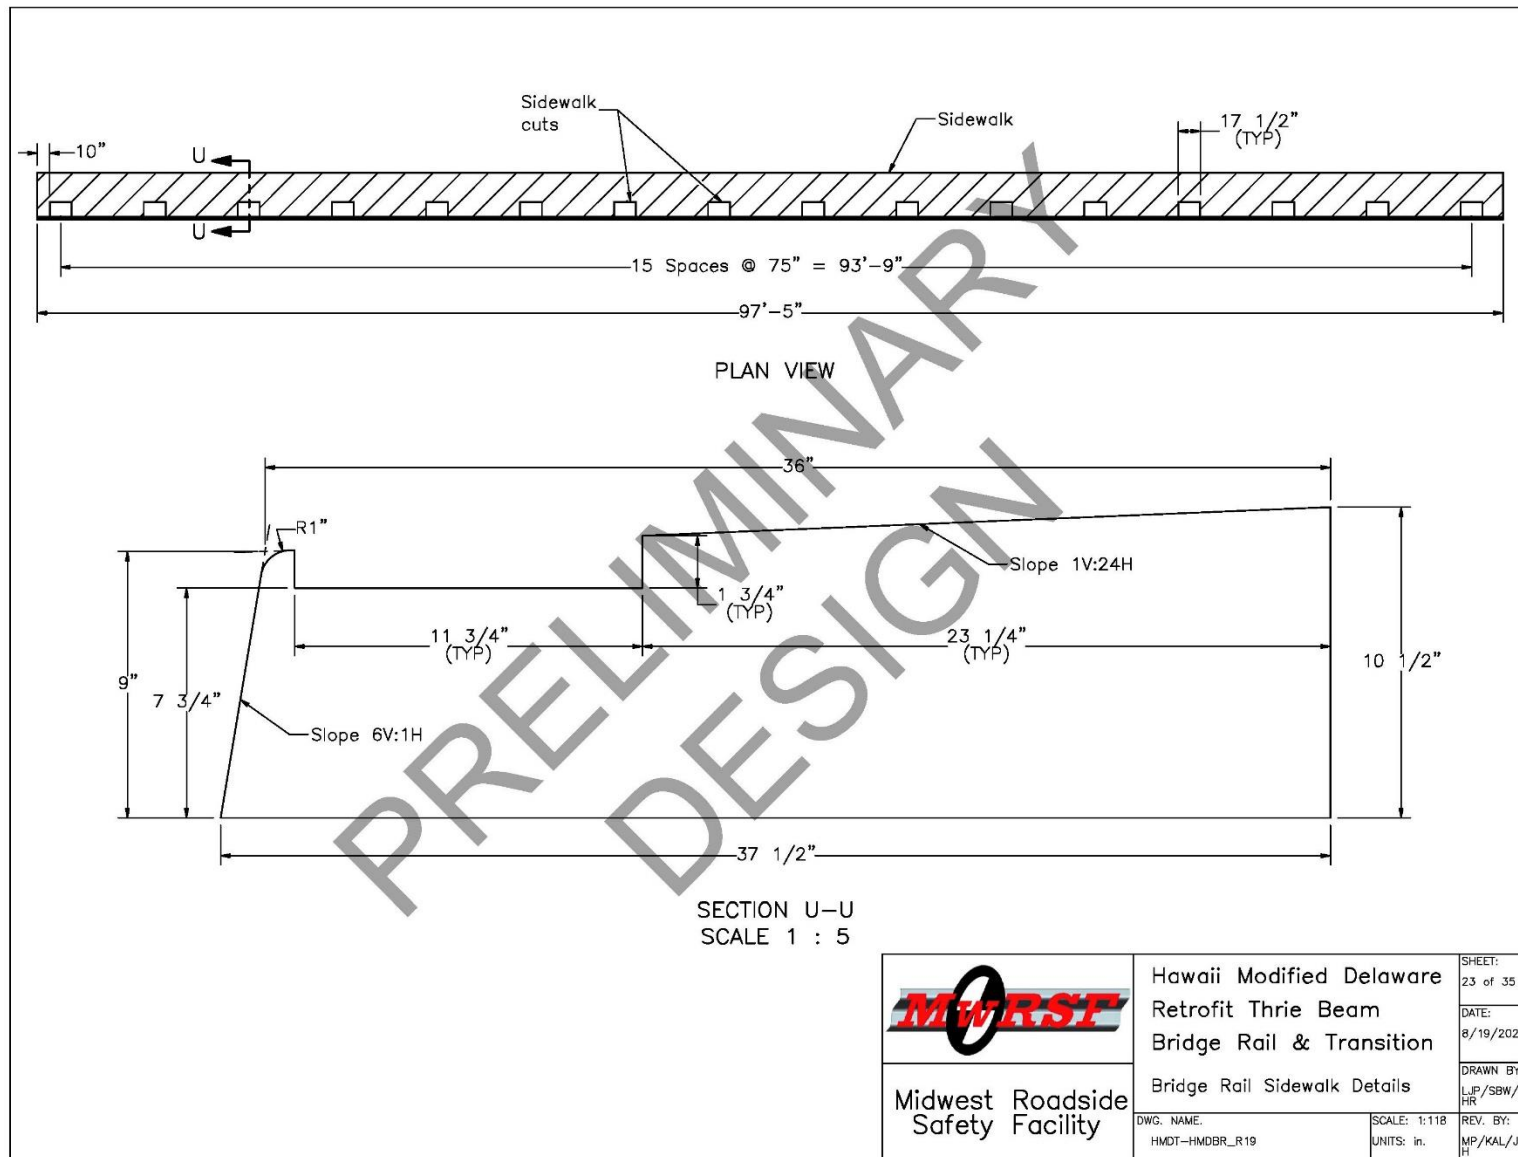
Bridge Rail Sidewalk Details, Test No. HMDT-1
